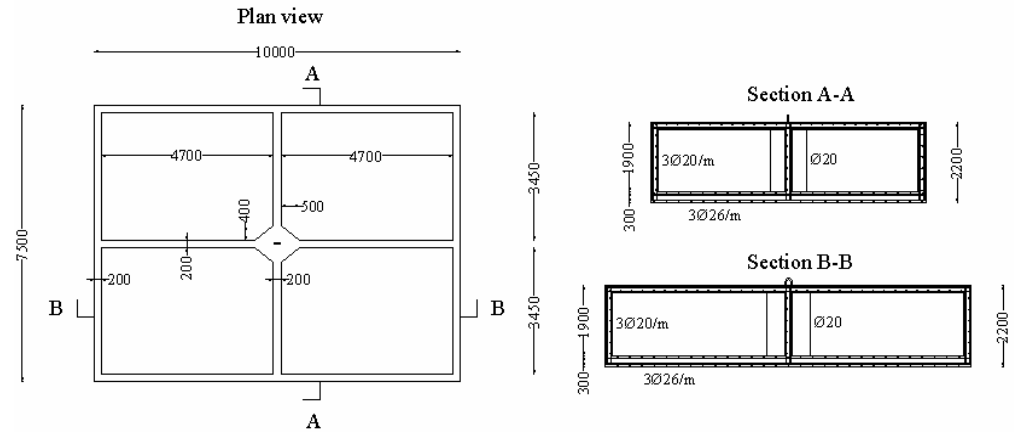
Plan view and sections of the pre-cast foundation: single block.
